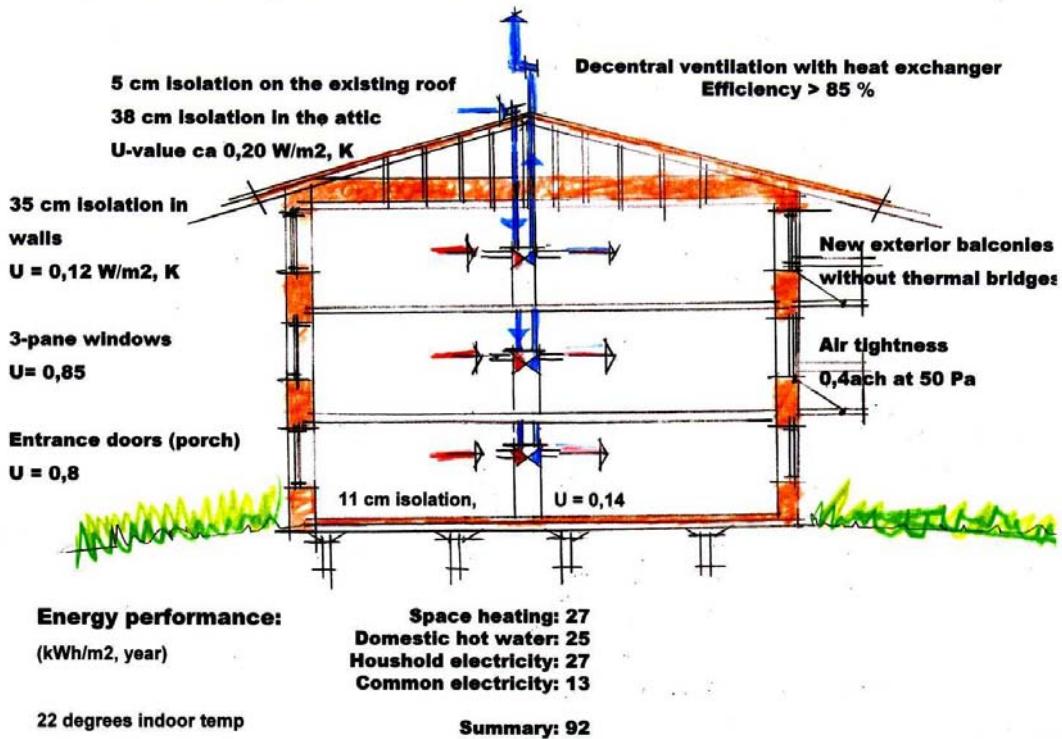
Building envelope and installations after renovation. Illustration by Hans Eek.
